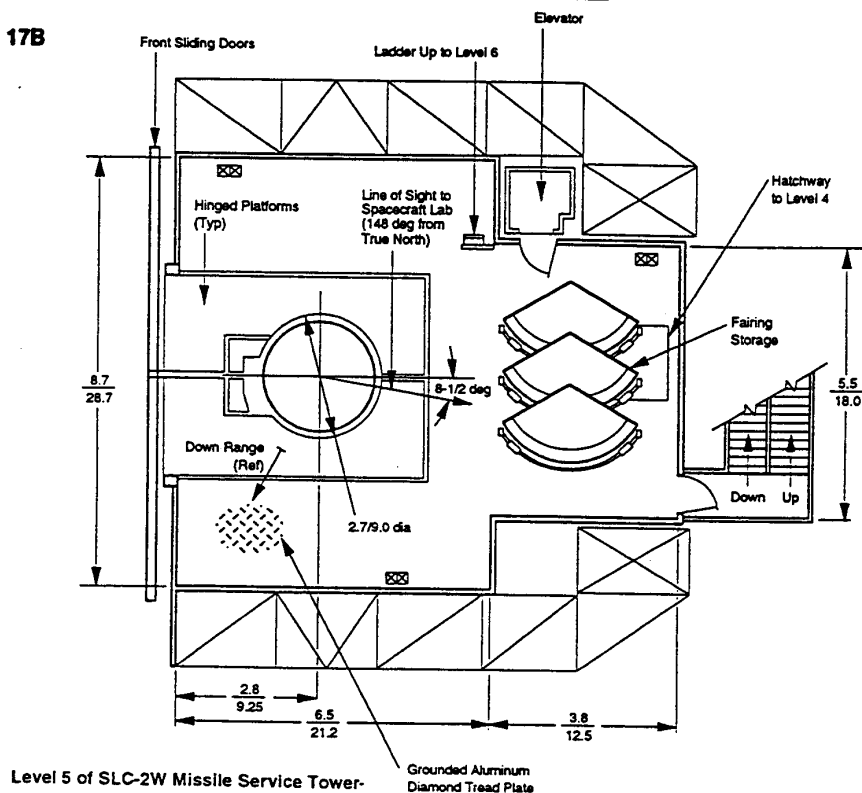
MST Floor Plans for CCAFS and VAFB
